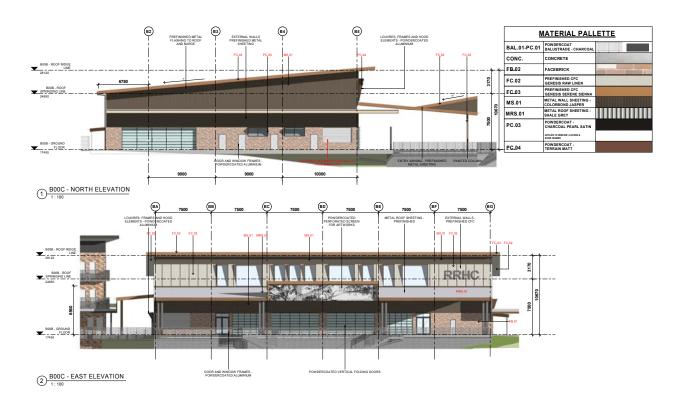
Building B - Elevations. Source: EJE Architects, 2025.
